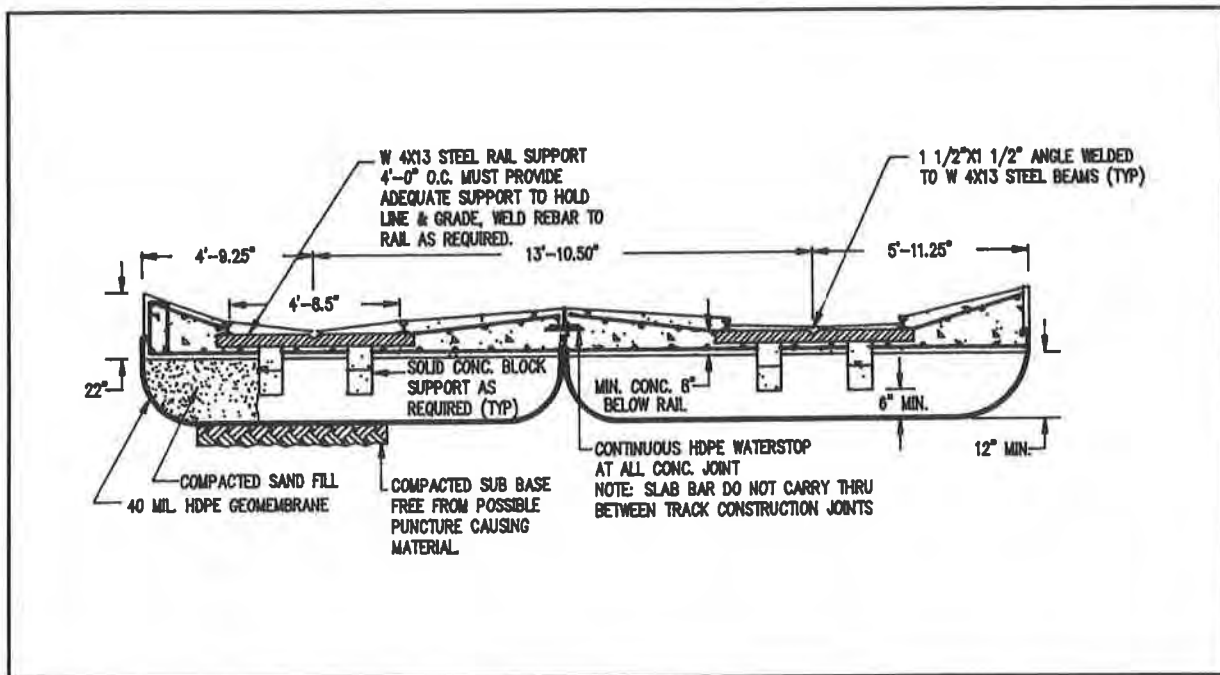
TYPICAL CROSS-SECTION OF CONCRETE ON SOIL CONTAINMENT SYSTEM
